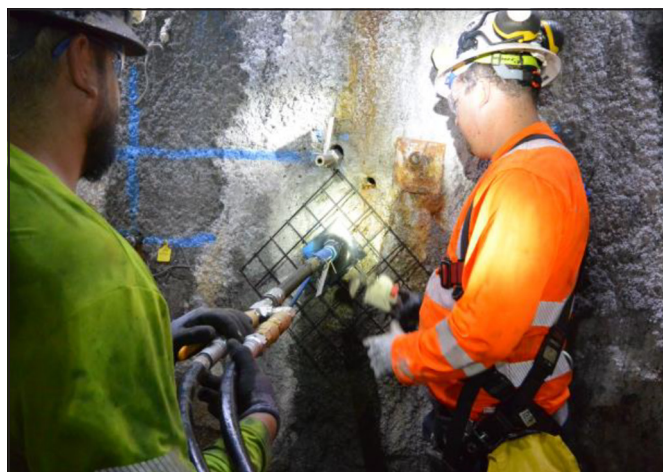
Pumping 2-part resin for test bolts in Old Electrical room, 68L
